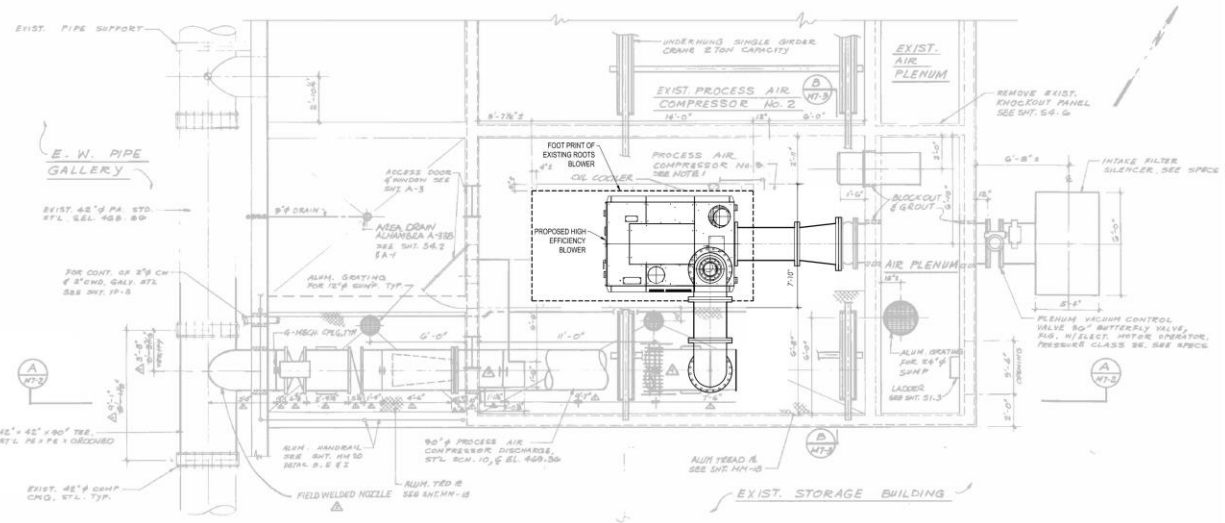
Proposed Blower Layout in Existing Roots Blower Bay
